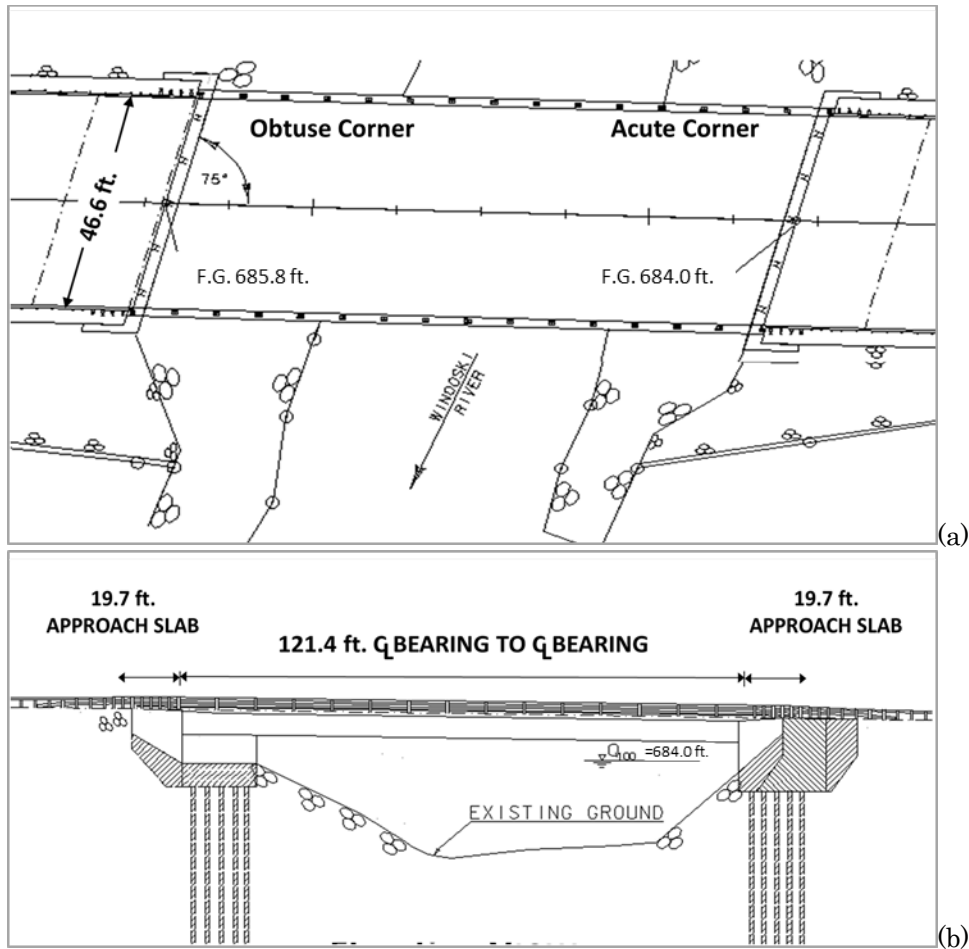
East Montpelier Bridge (a) plan view (b) elevation view
